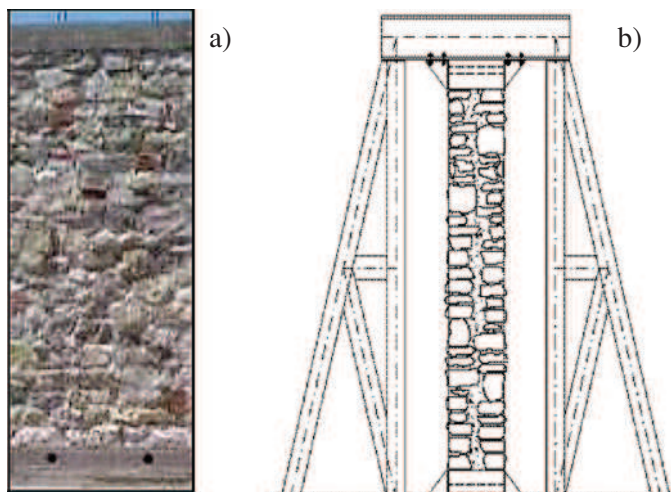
Single panel (a) and steel frame (b) for shaking table tests
